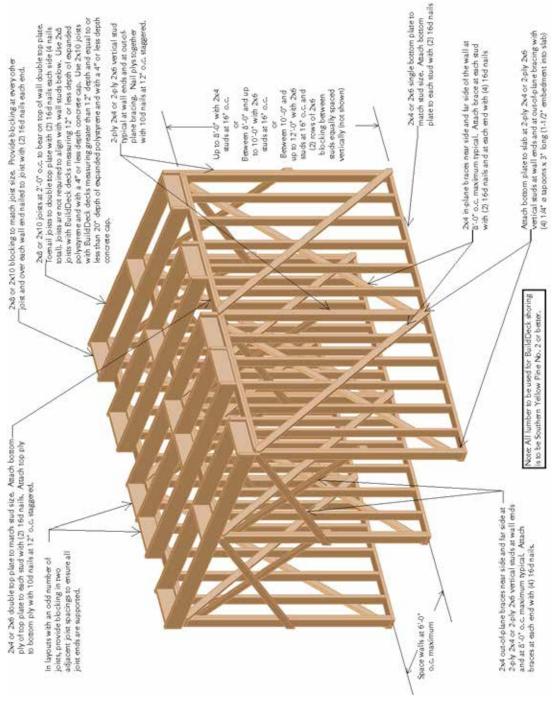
BuildBlock BuildDeck Shoring System for BuildDeck BD-800, BD-1000, and BD-1200 with up to an 8" expanded polystyrene riser and up to a 4" thick concrete deck.
